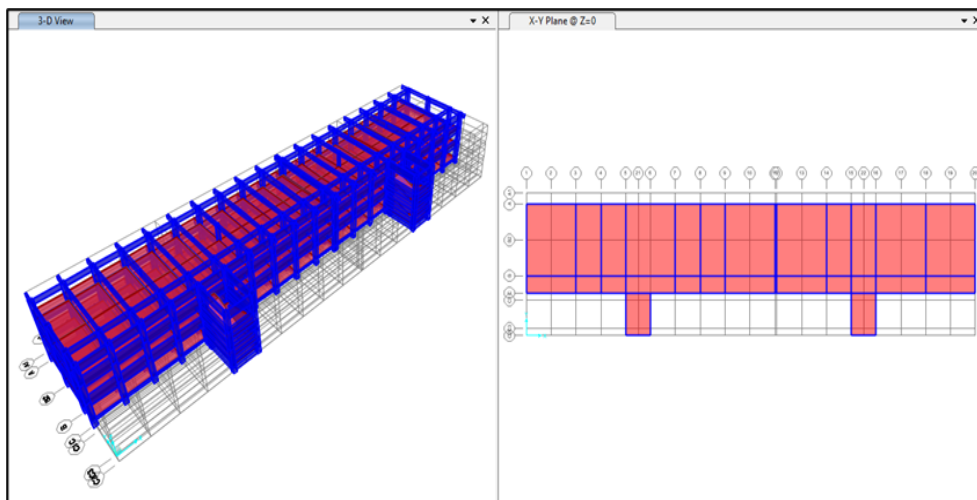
3D view and typical floor plan of Building 1 (analysis taken from SAP2000 software).
